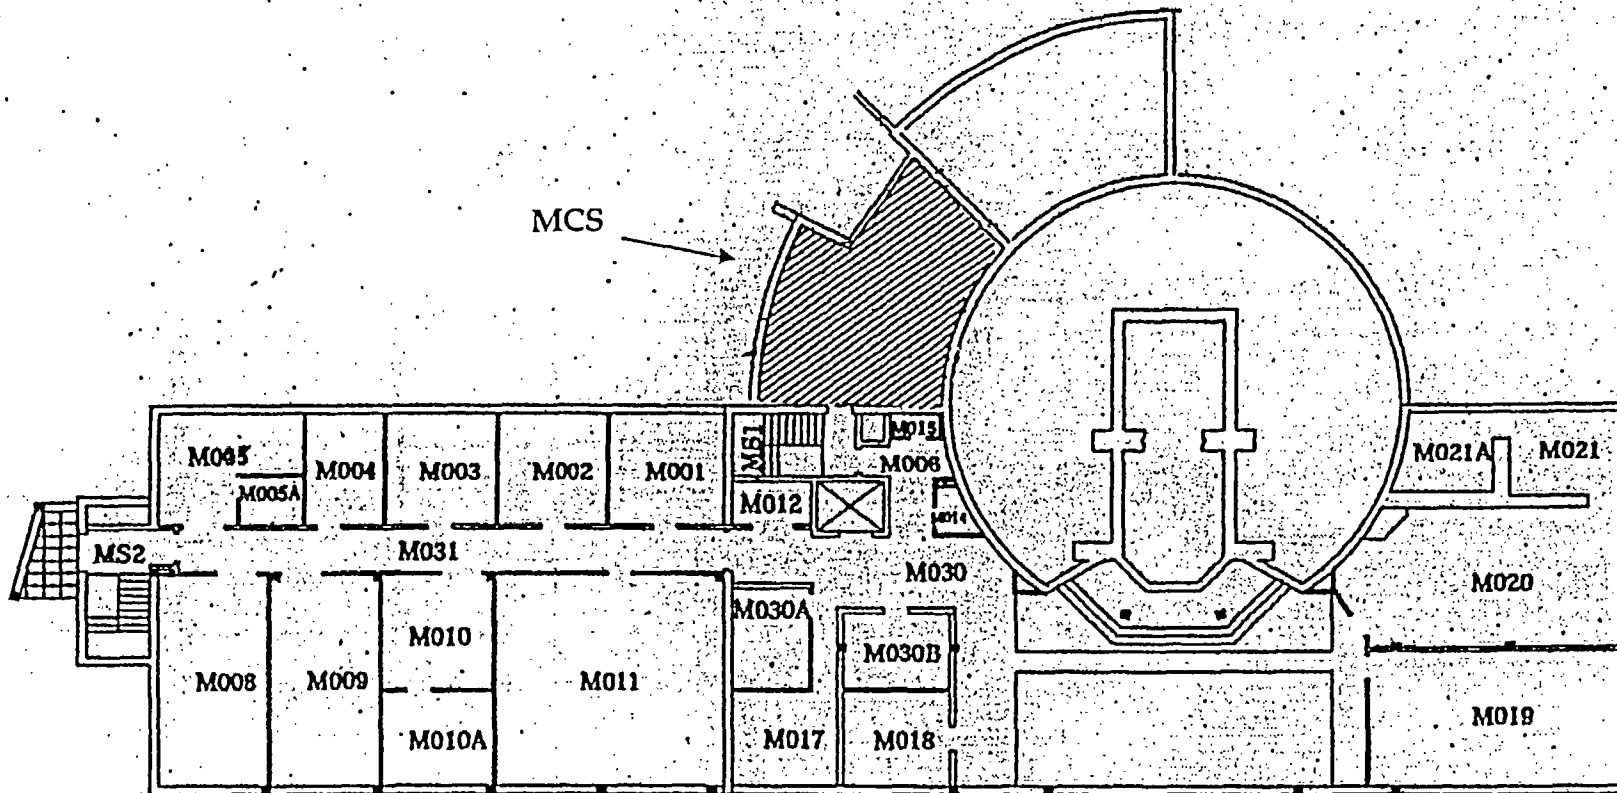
UVA Mezzanine Floor Plan View Indicating the Location of the Mezzanine Crawl Space.
